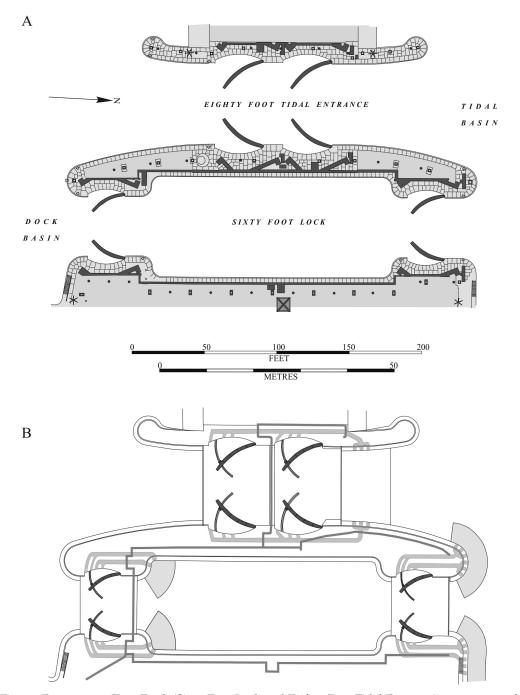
Entrances to Tyne Dock (Sixty-Foot Lock and Eighty-Foot Tidal Entrance) as constructed. It is a transcription from plate 7 of Harrison (1859). A: Plan of the entrance piers.B: Sluices (pale tone) and hydraulic systems (thin, dark line) within the piers and also showing masonry aprons around certain edges of the Sixty Foot Lock.
